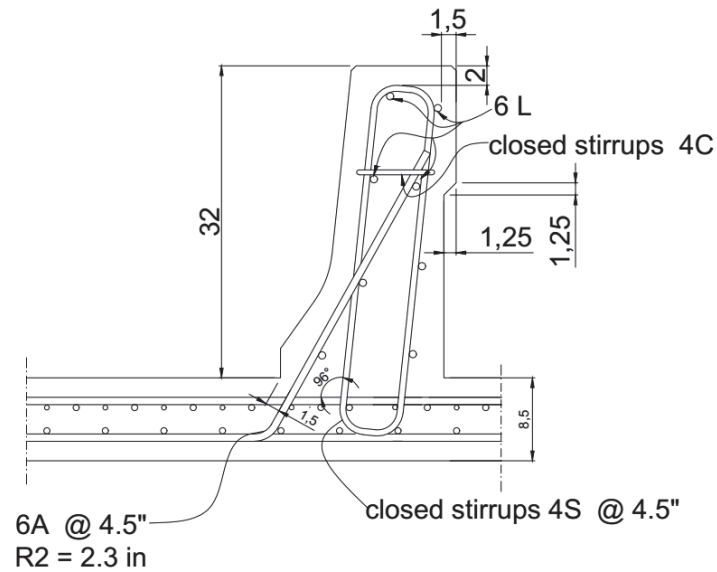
typical section with inclined close stirrups, $C_c=2$ in (1 in = 25.4 mm)
